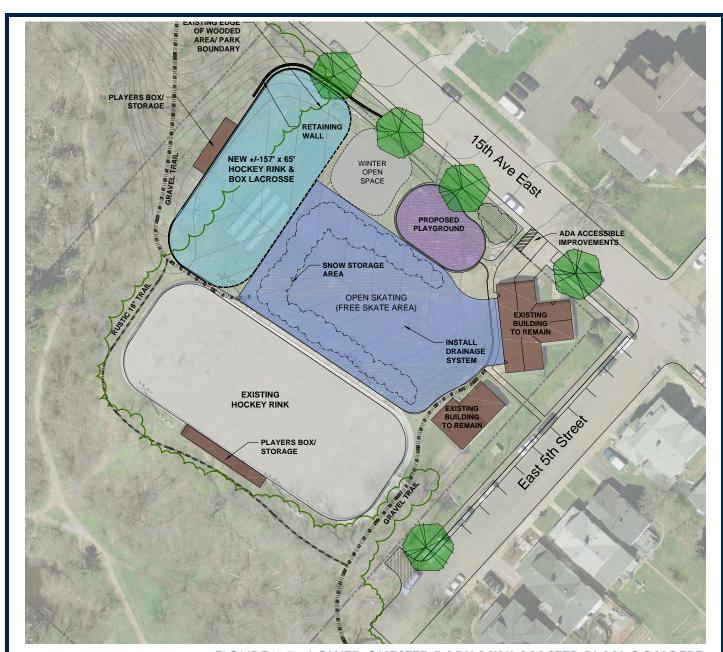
LOWER CHESTER PARK MINI-MASTER PLAN CONCEPT
